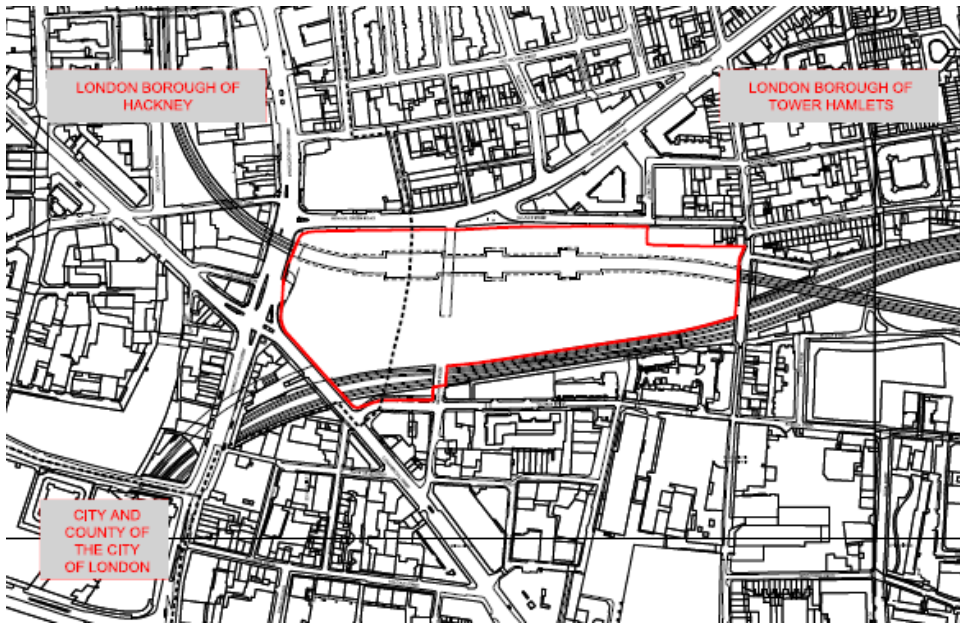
plan showing the site (red outline) and borough boundaries (black dotted lines)
